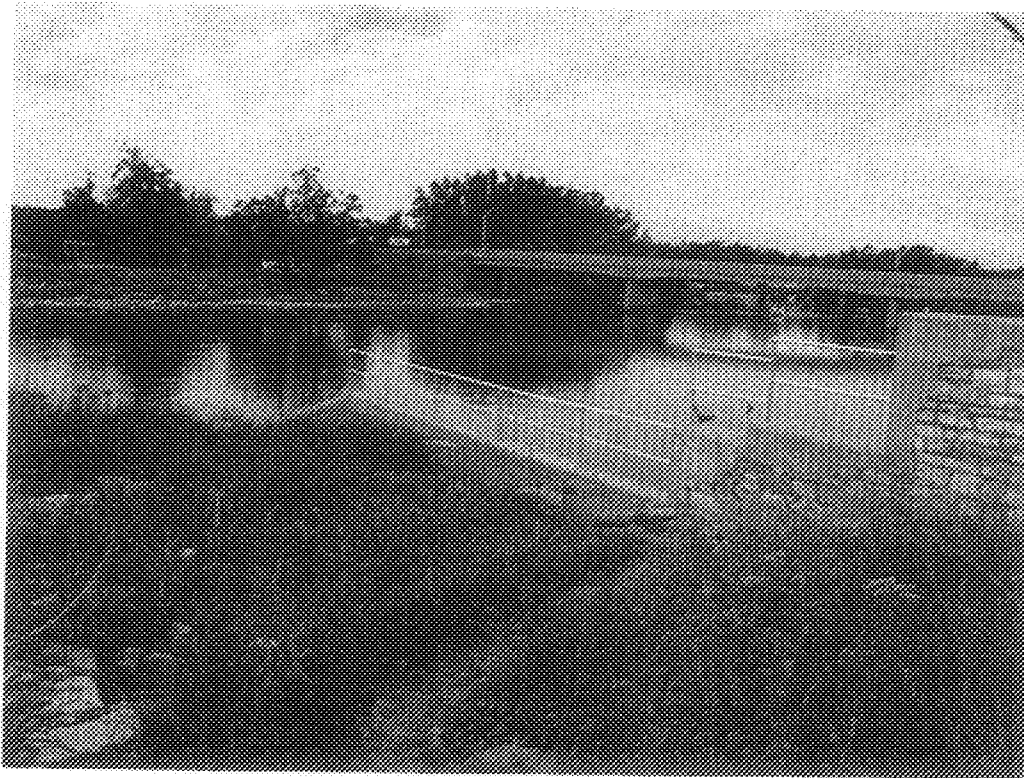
View of fishing access along the tailrace of Dam No. 16.
